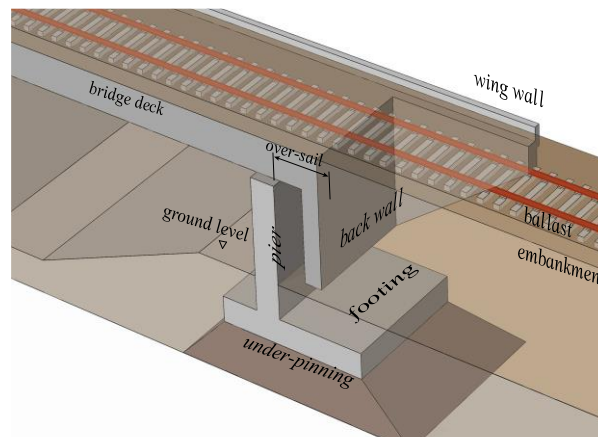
Illustration of a typical integral abutment in the Swedish bridges (Andersson et al., 2021).
